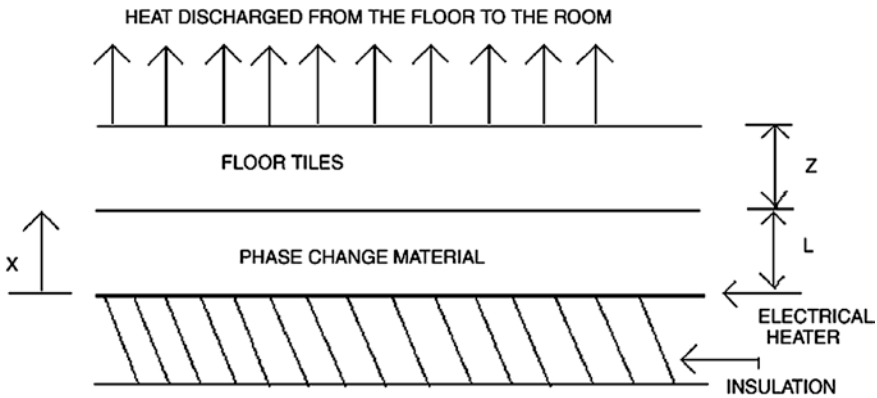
Sketch of underfloor heating system incorporating heat storage system
